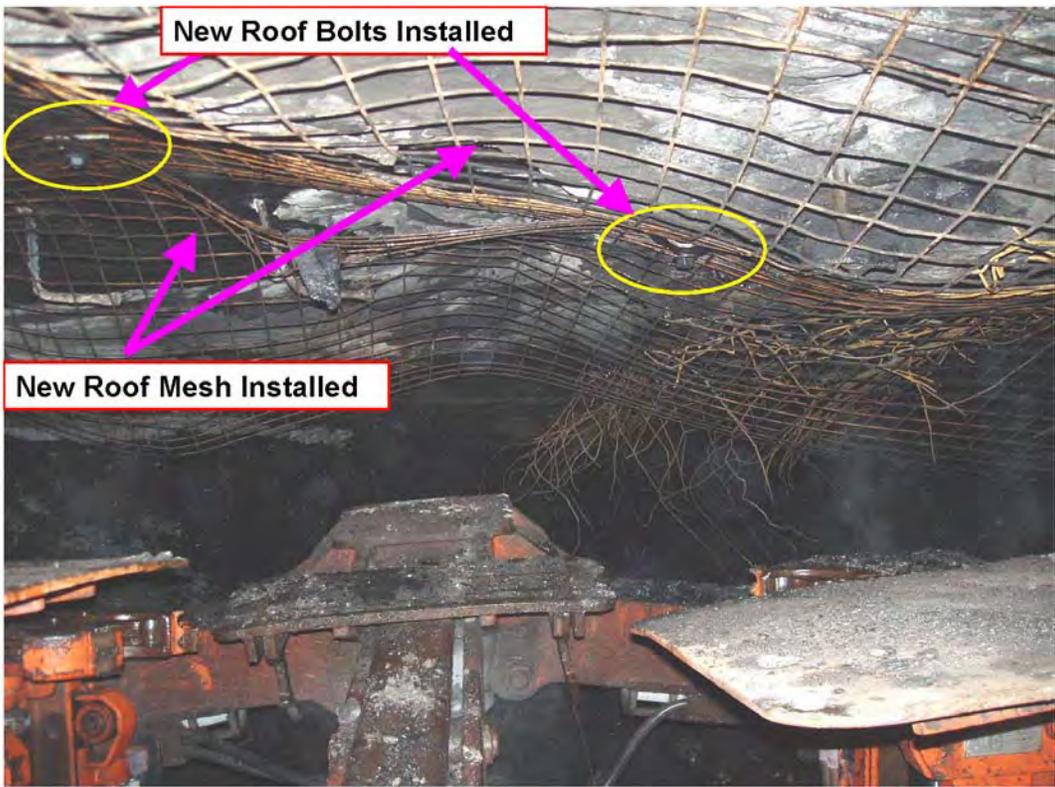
New Roof Bolts and New Wire Mesh Installed in the No. 1 Entry
